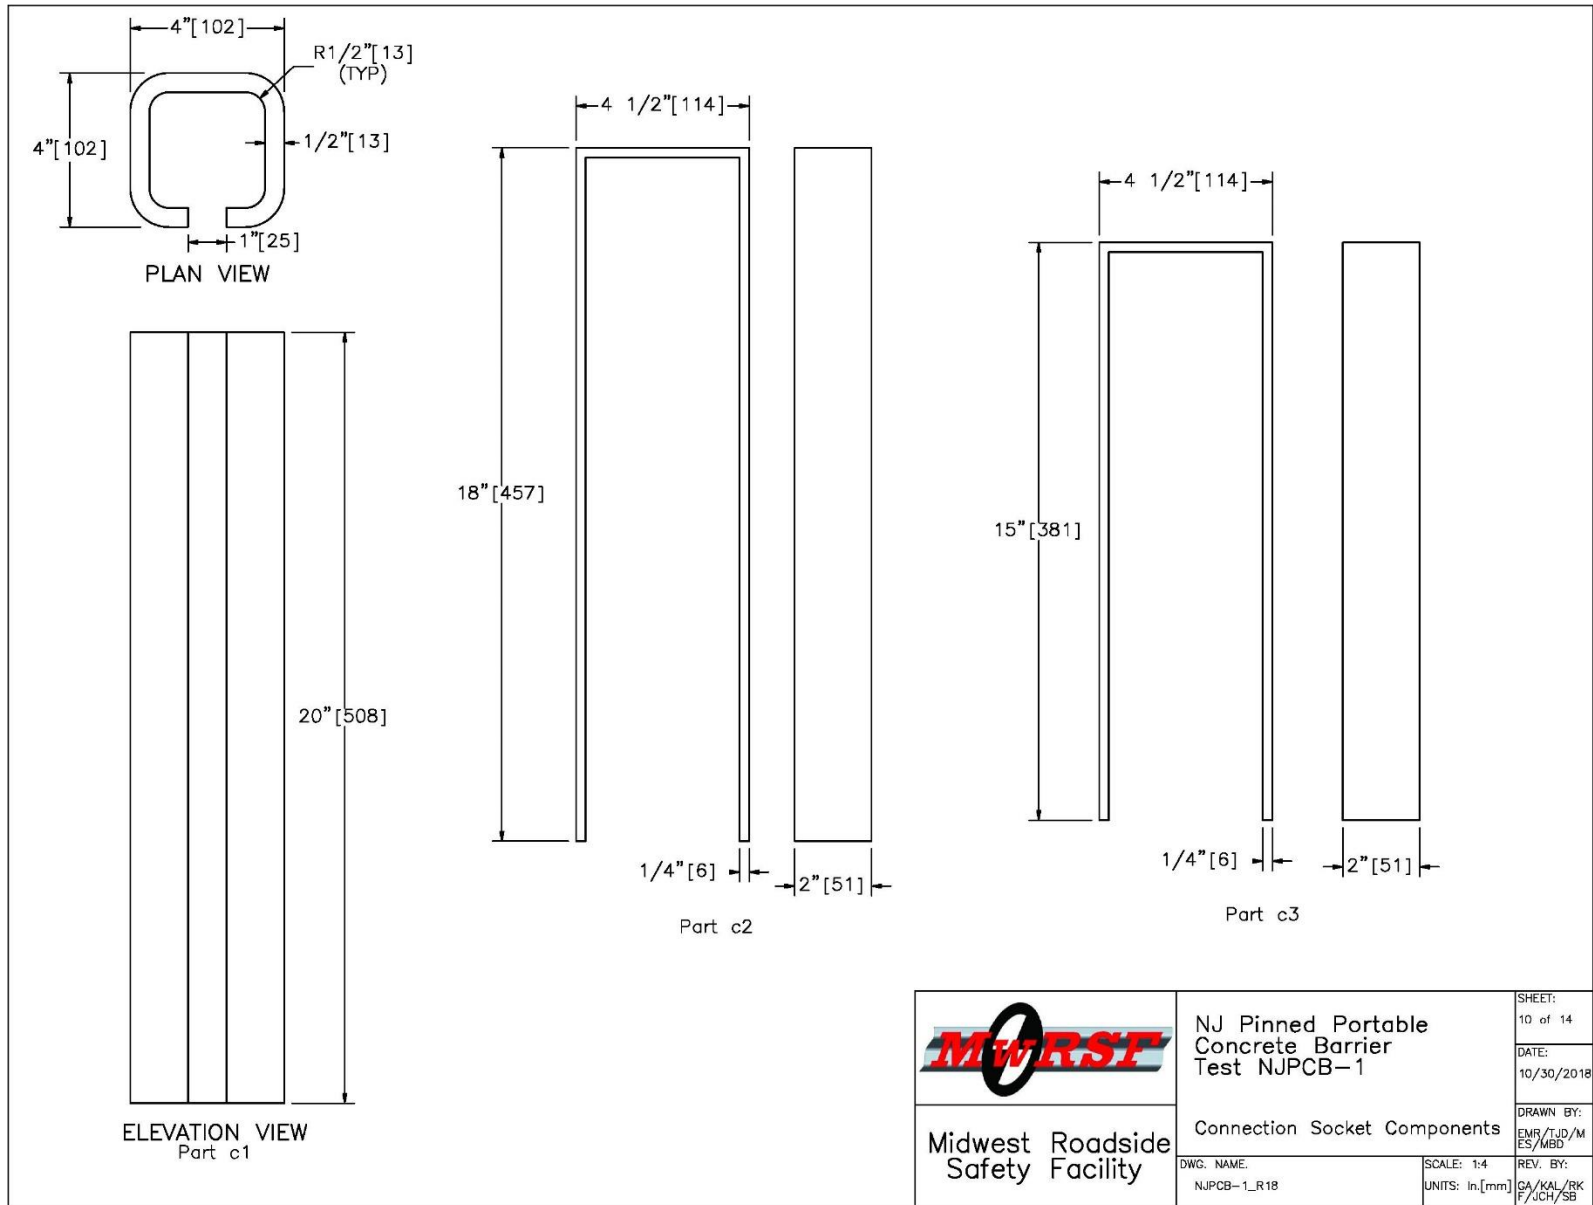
PCB Connection Socket Component Details, Test No. NJPCB-1
